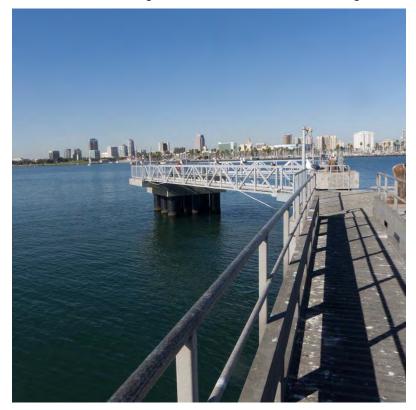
Facing north- View of catwalk to northern mooring dolphin.
